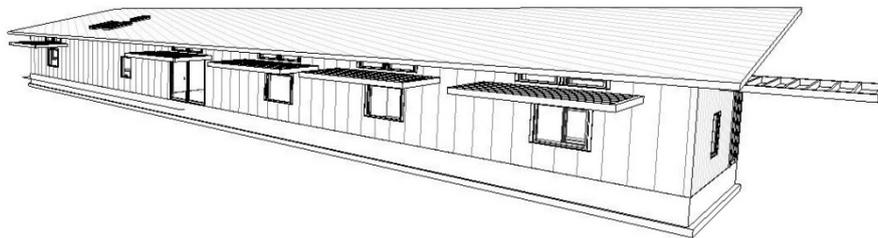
Revit 3D angled view of north facing wall of building
